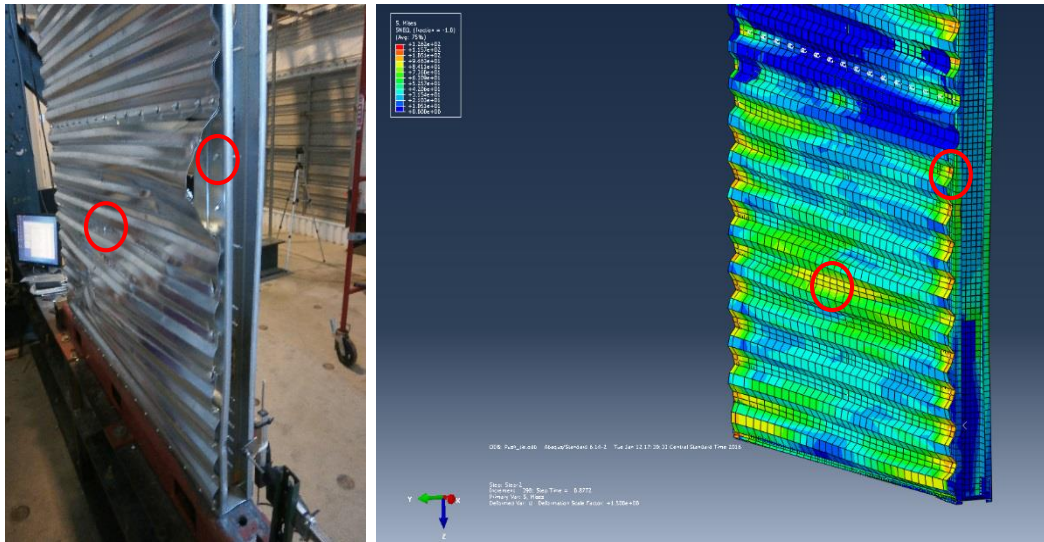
Model 1: sheathing to frame connection failure
